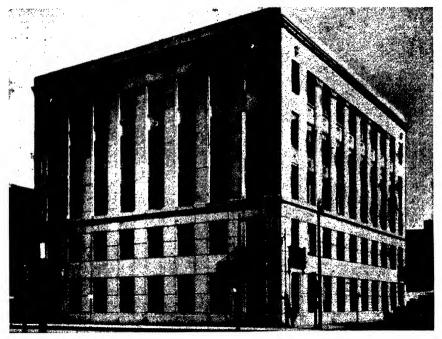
Precast concrete blocks were used instead of cut stone for the exterior walls of the Portland Cement Association building, Chicago, Ill. (Portland Cement Association.)
